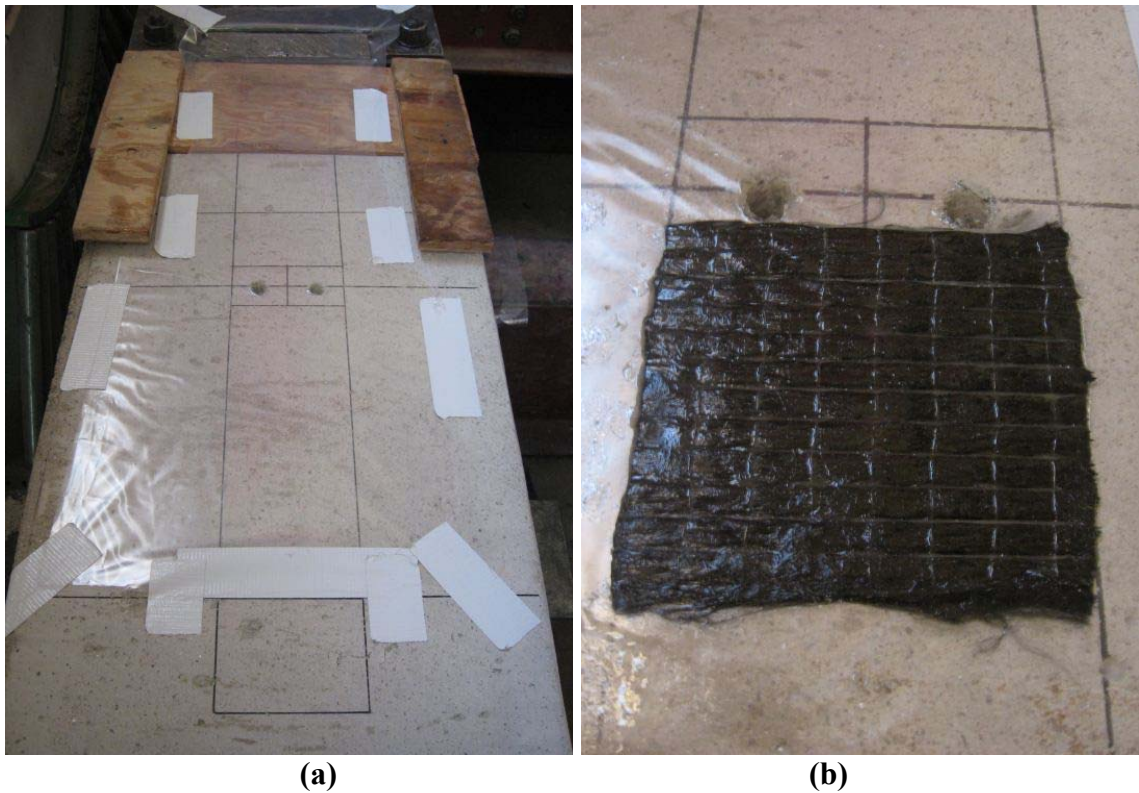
(a) Setup for specimens F1-2a-24U and F4a-1-24U. (b) Prior to application of FRP sheet a transverse sheet was placed under specimen to prevent anchors from splitting the specimen.
